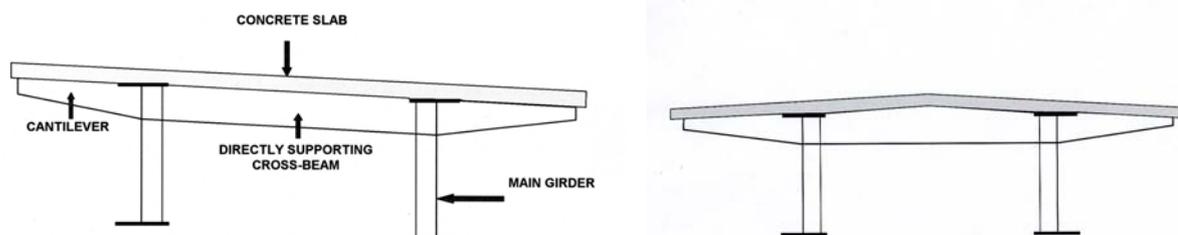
Twin girder directly supporting cross-beam composite bridge with cantilevers (pavement unidirectional banking at left - bidirectional banking at right)
